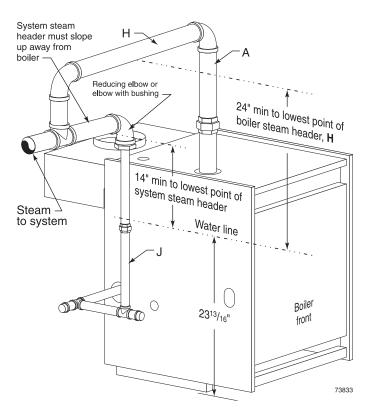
Recommended piping, piping for parallel-flow systems only.
